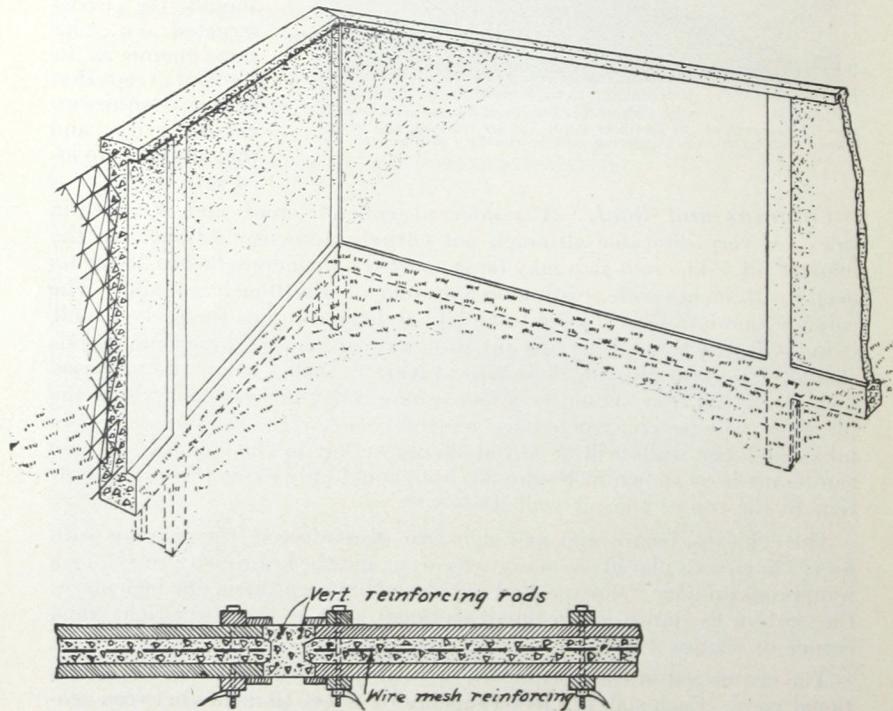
Barnyard Wall of Concrete, with horizontal section showing forms.
